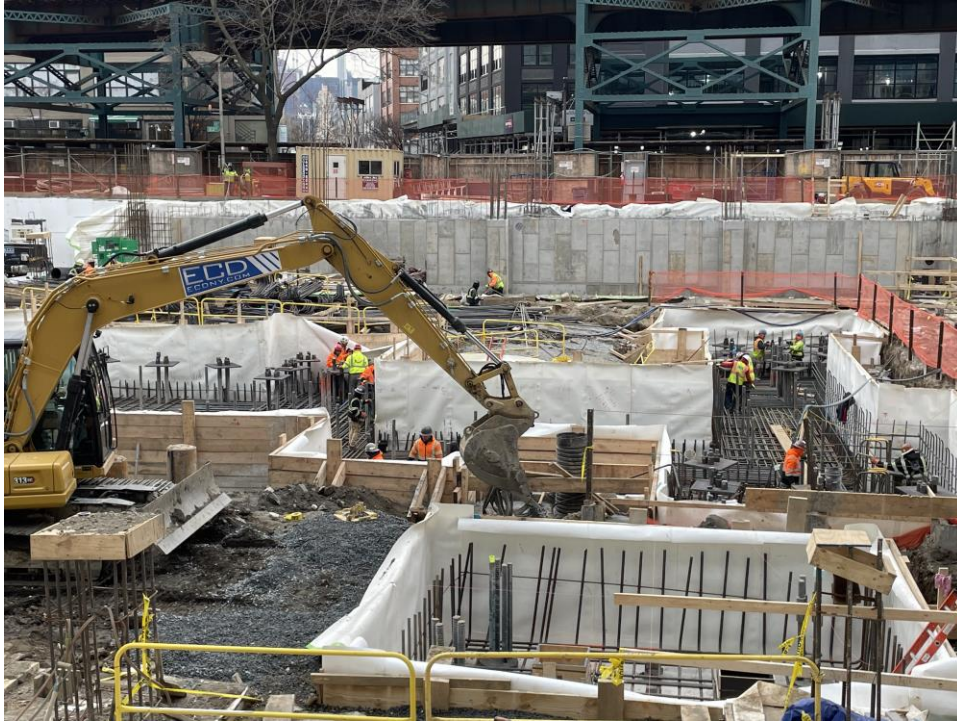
ECD backfilling in the northeast part of the site (facing west).
